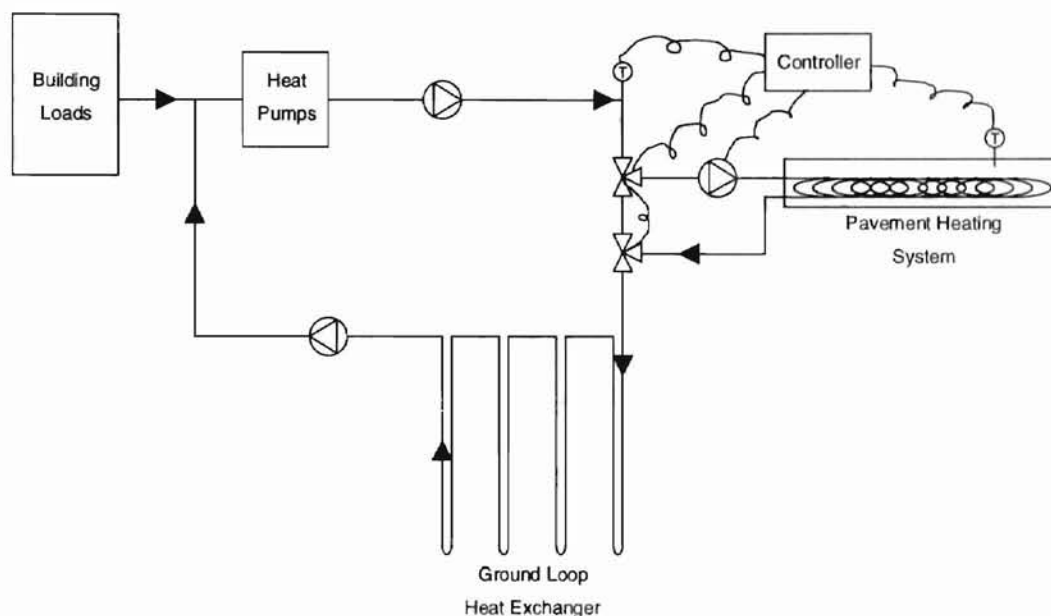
System schematic for the example model of a GSHP system with a pavement heating system supplemental heat rejecter.
